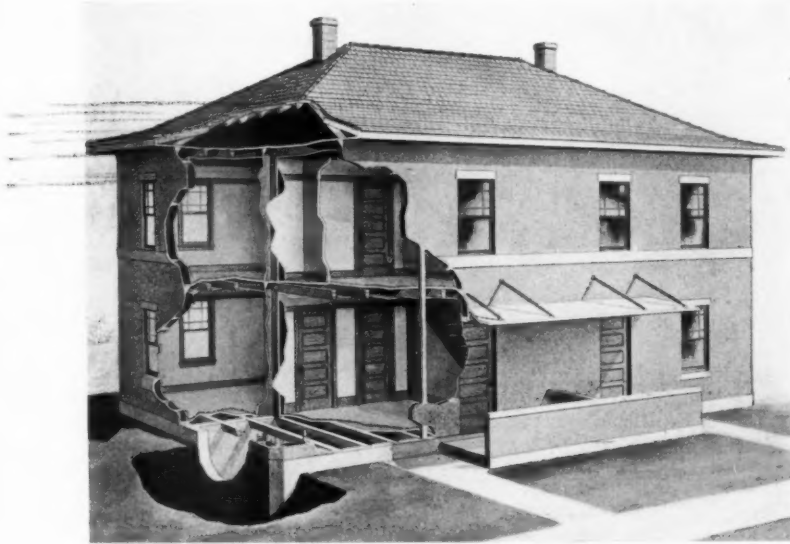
TYPICAL DETAIL OF GUN-CRETE HOUSE CONSTRUCTION
